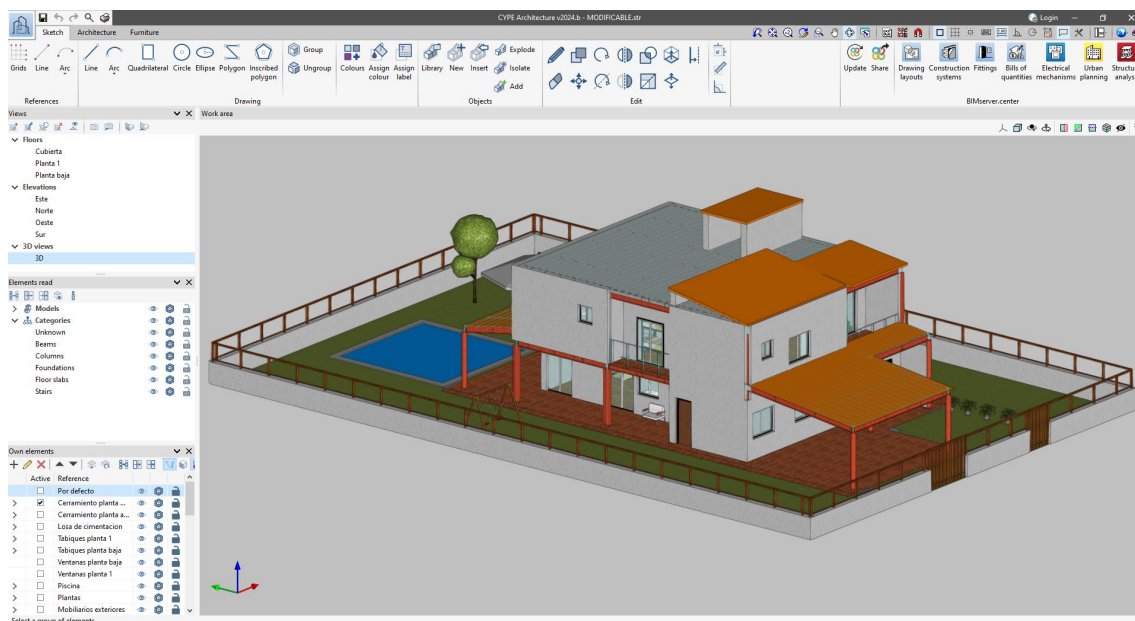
Architectural elements of the steel structure house in Cype Architecture
